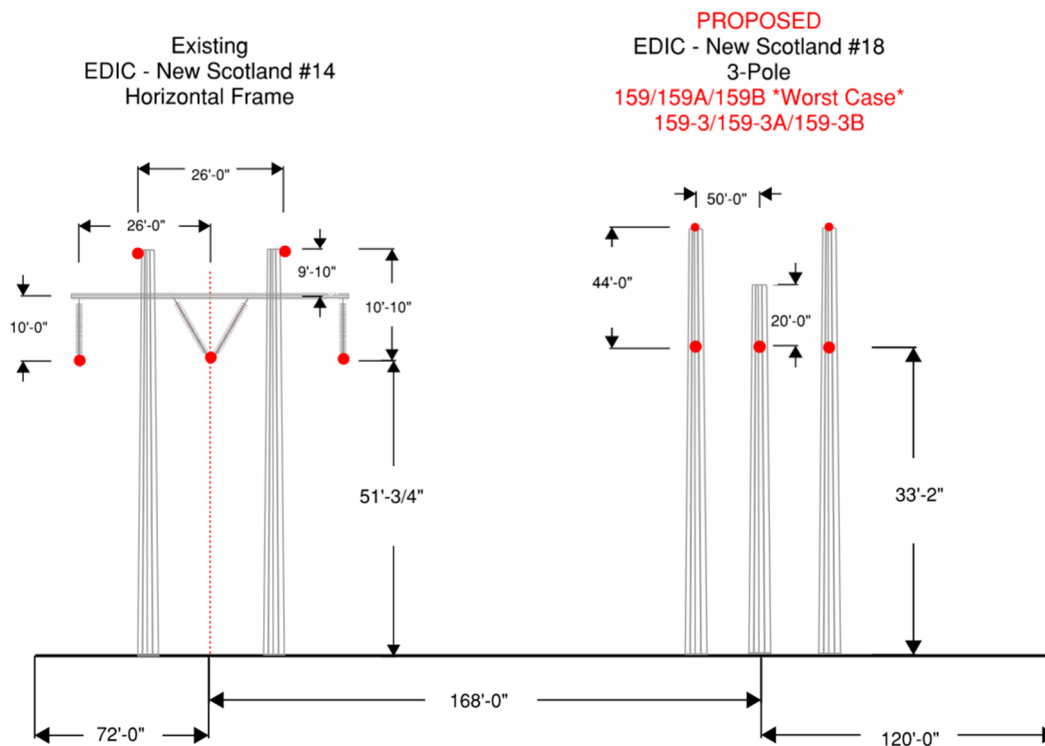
Existing Line #14 and Proposed Line #18 3-Pole Cross Section
